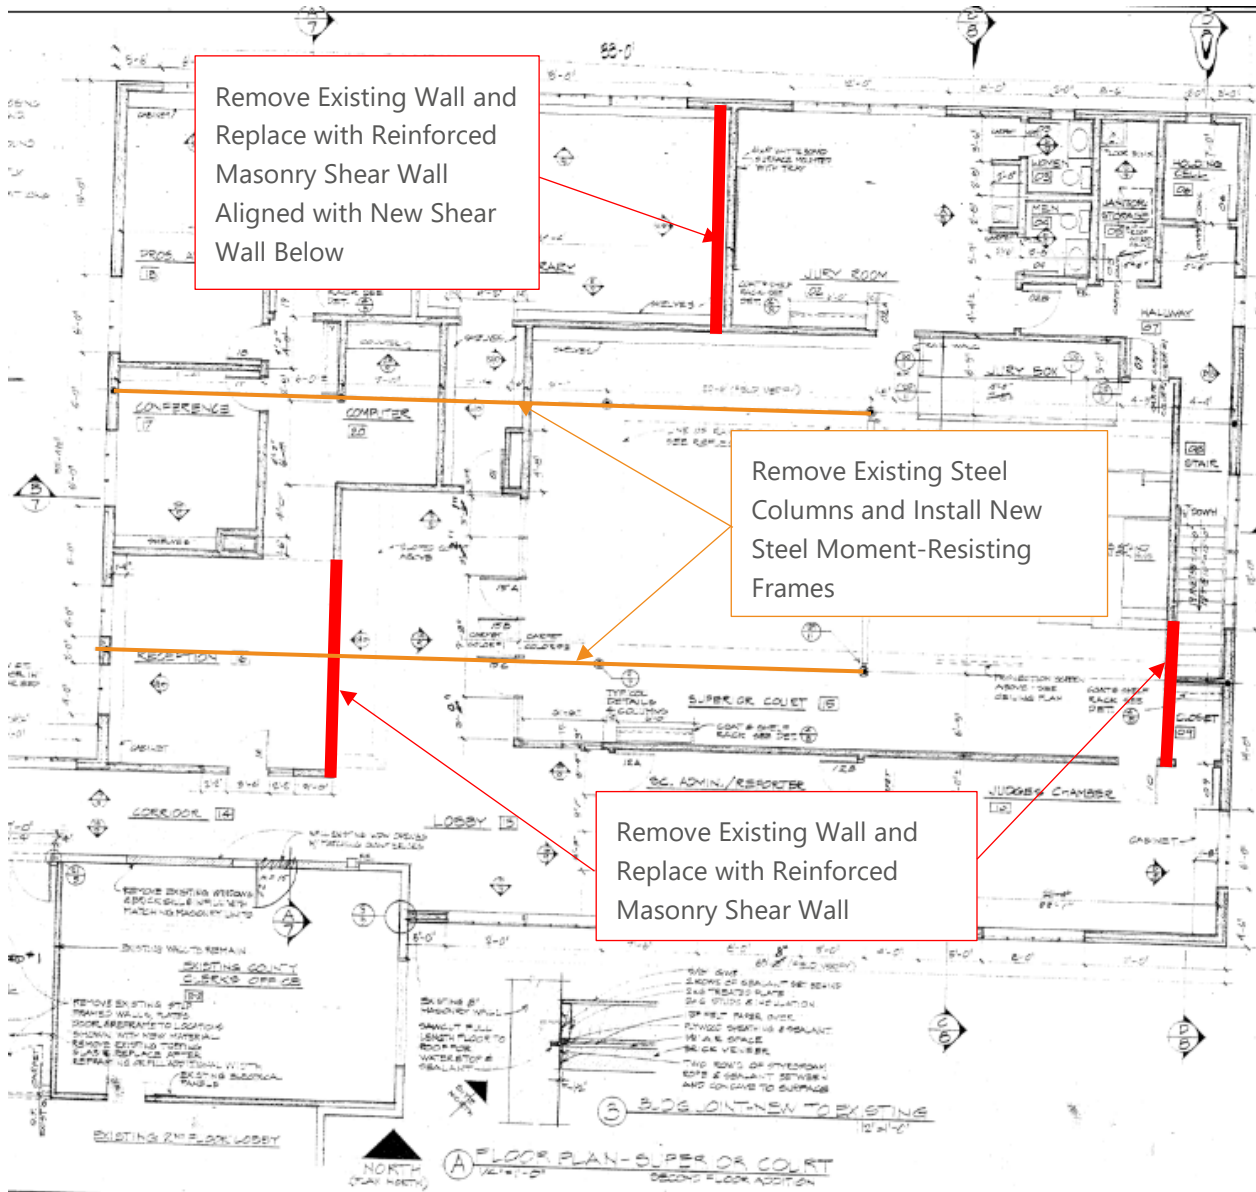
Proposed Second Story Strengthening Concept for the 1980s Courthouse Addition
